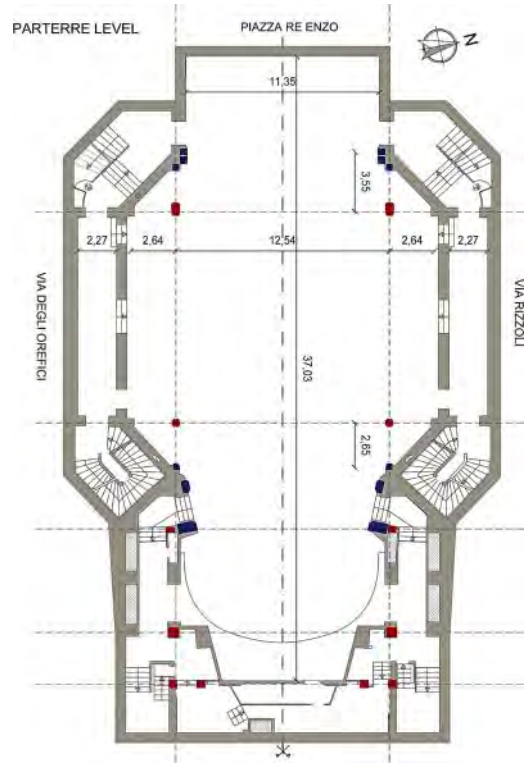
Types of vertical structures at the parterre level: in grey, masonry structures; reinforced concrete structures in red, unreinforced concrete structures in blue.
